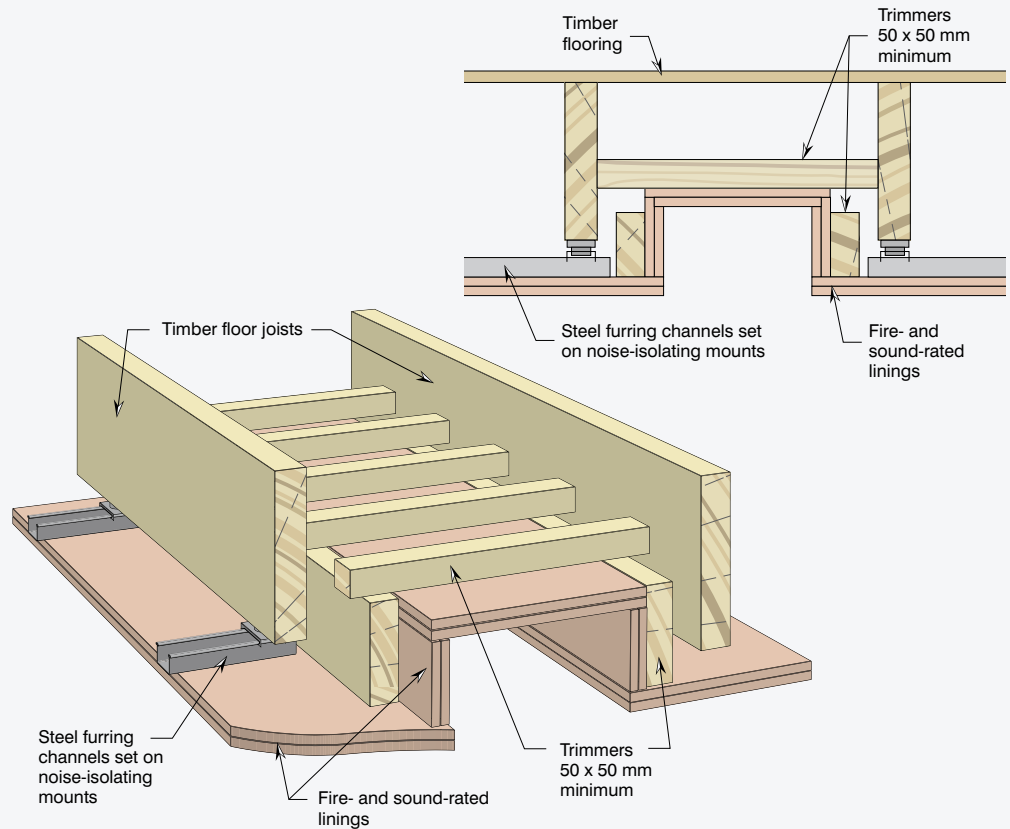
Framing details for recessed light in fire-rated floor/ceiling.
